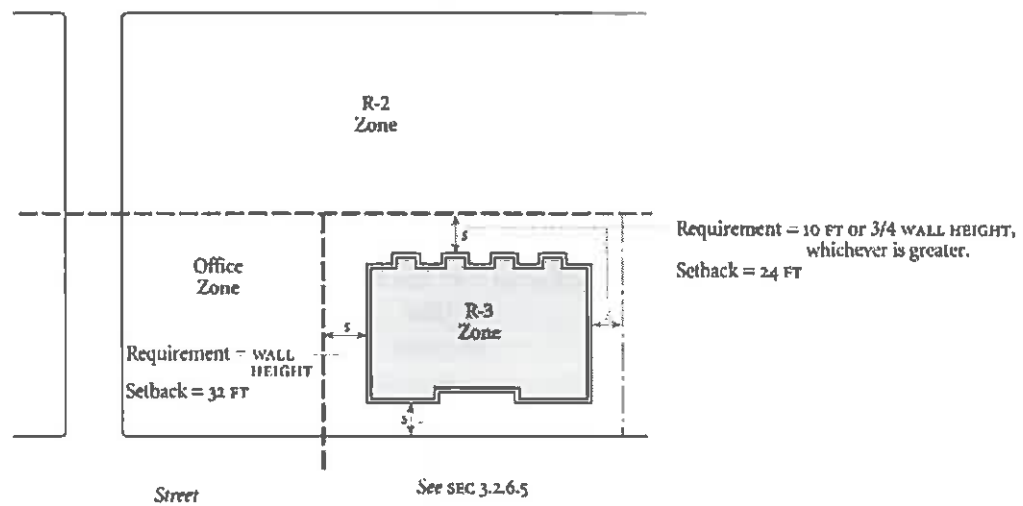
B-4: Example of Perimeter Yard (Wall Height = 32')
